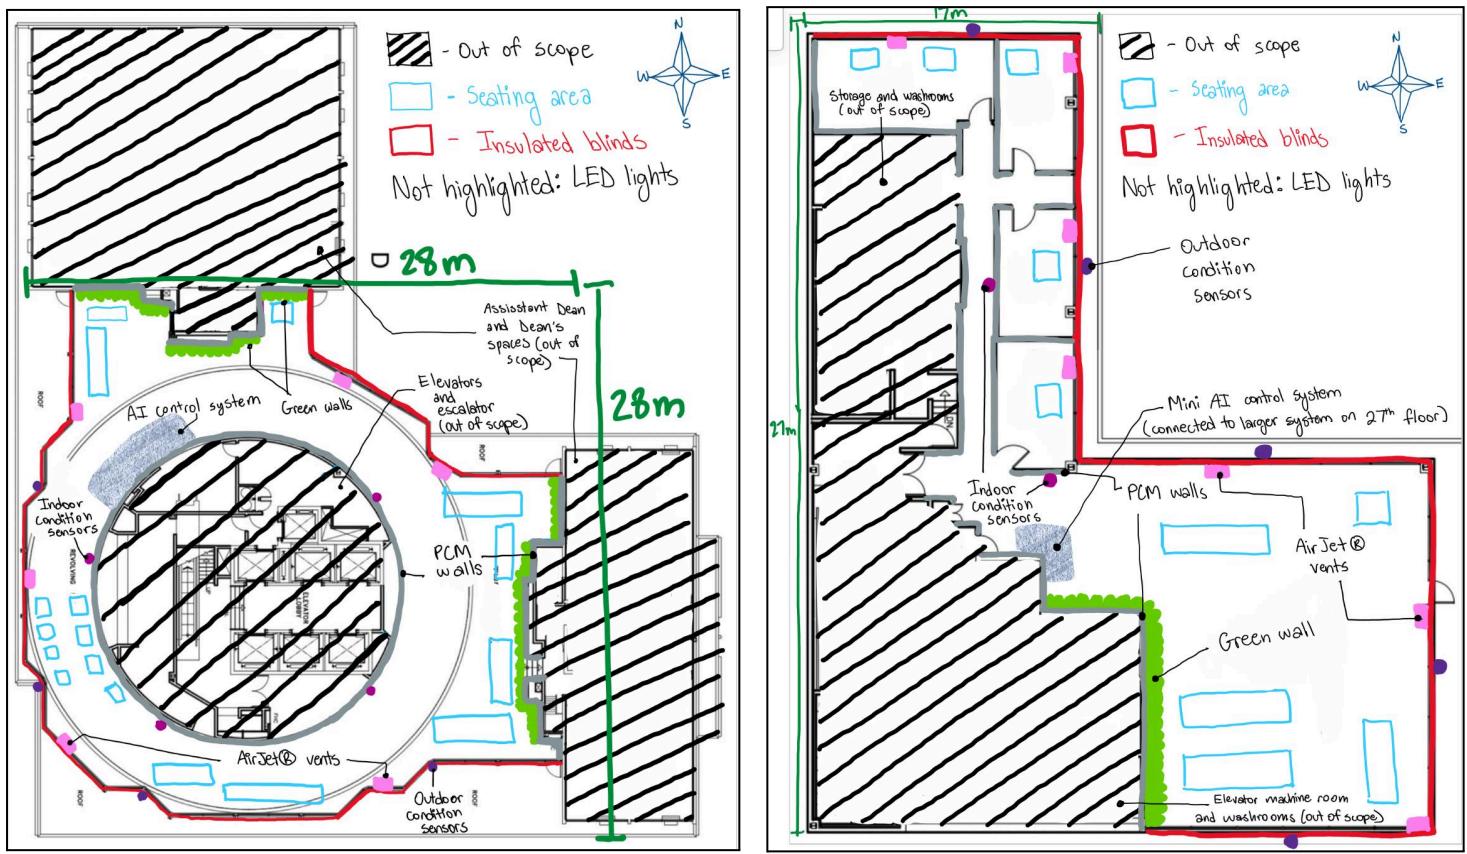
Floor plan of Solution 1 on the 27th (left) and 28th (right) floors.
